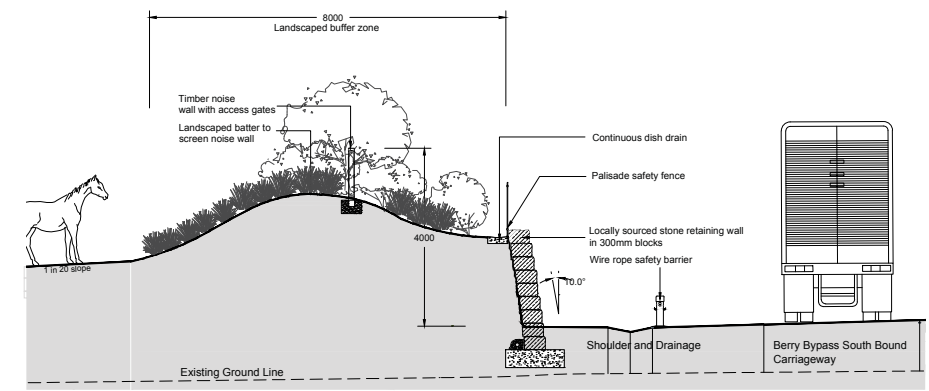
North Street noise barrier EA Concept Design option 3 – combined stone wall and timber fence
